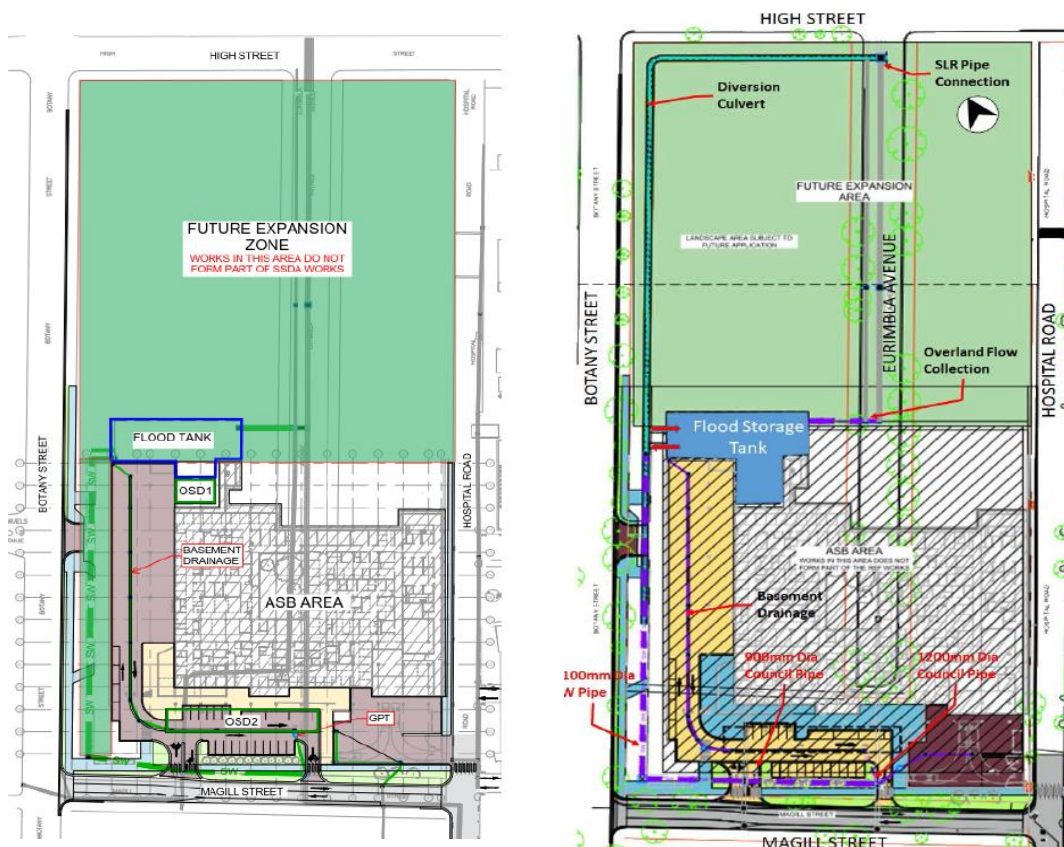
Stormwater plan for the proposed development (left) and Stormwater diversion layout (right)
